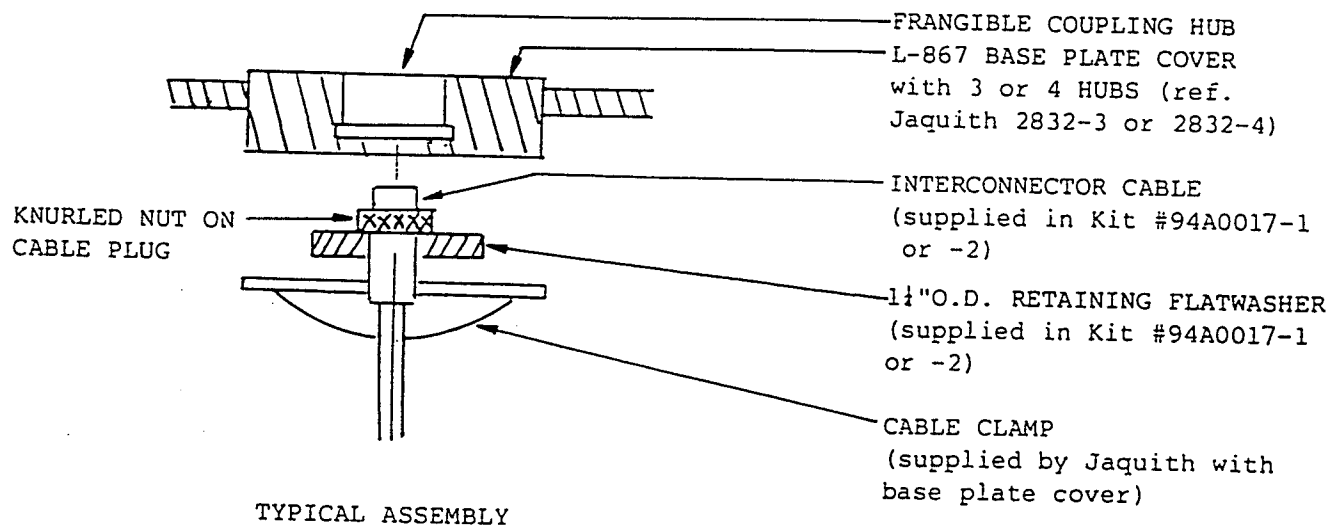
TYPICAL CABLE ASSEMBLY USING RETAINING WASHER
